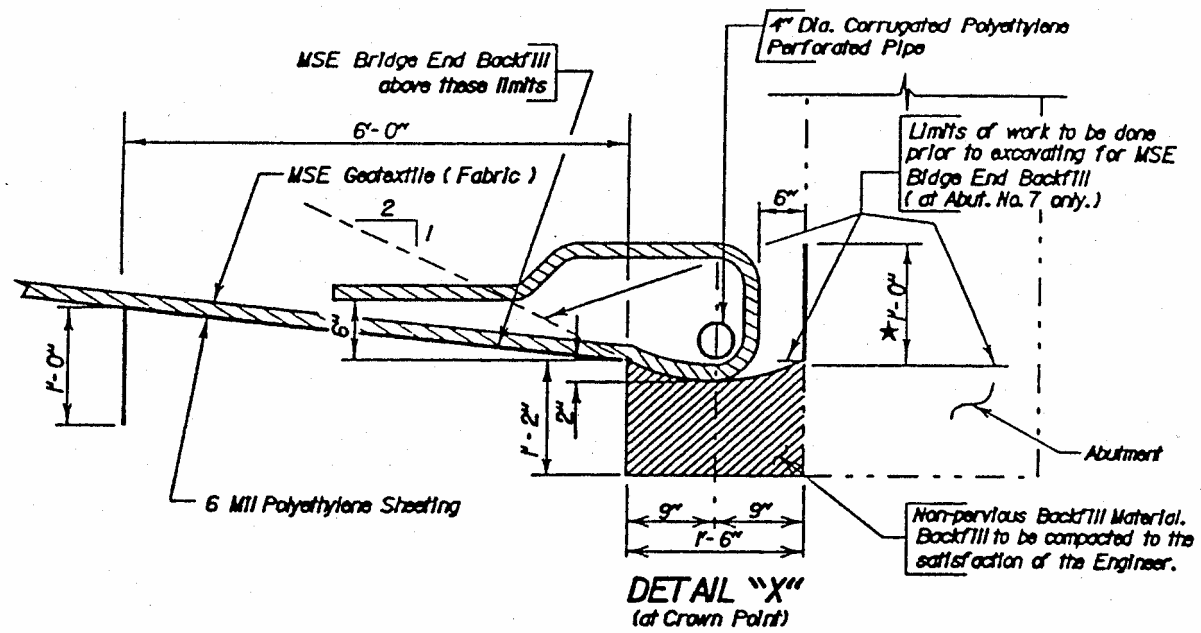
Design detail as of 1999 showing the first layer of the geotextile reinforced soil wall
